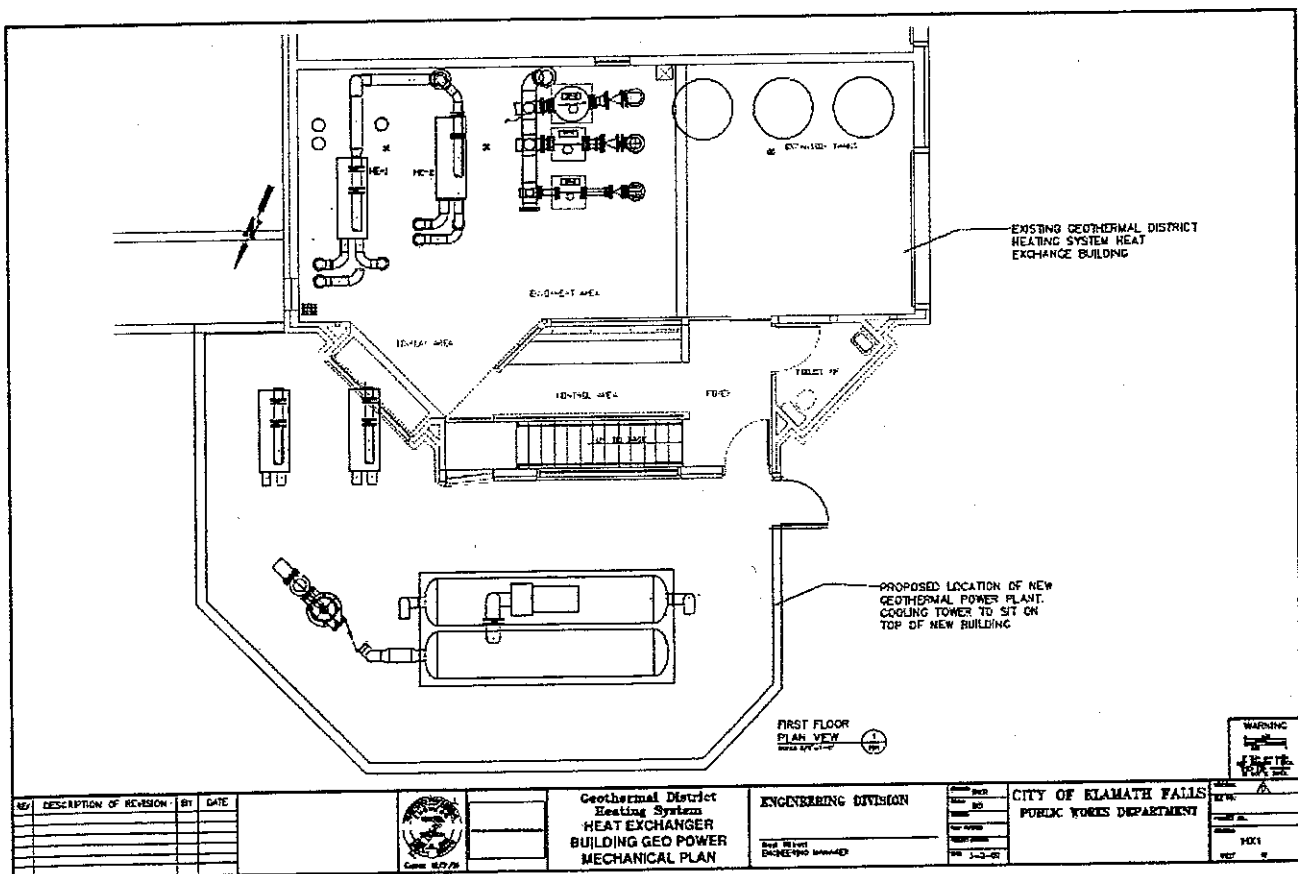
Preliminary site plan for the proposed new geothermal power plant.
